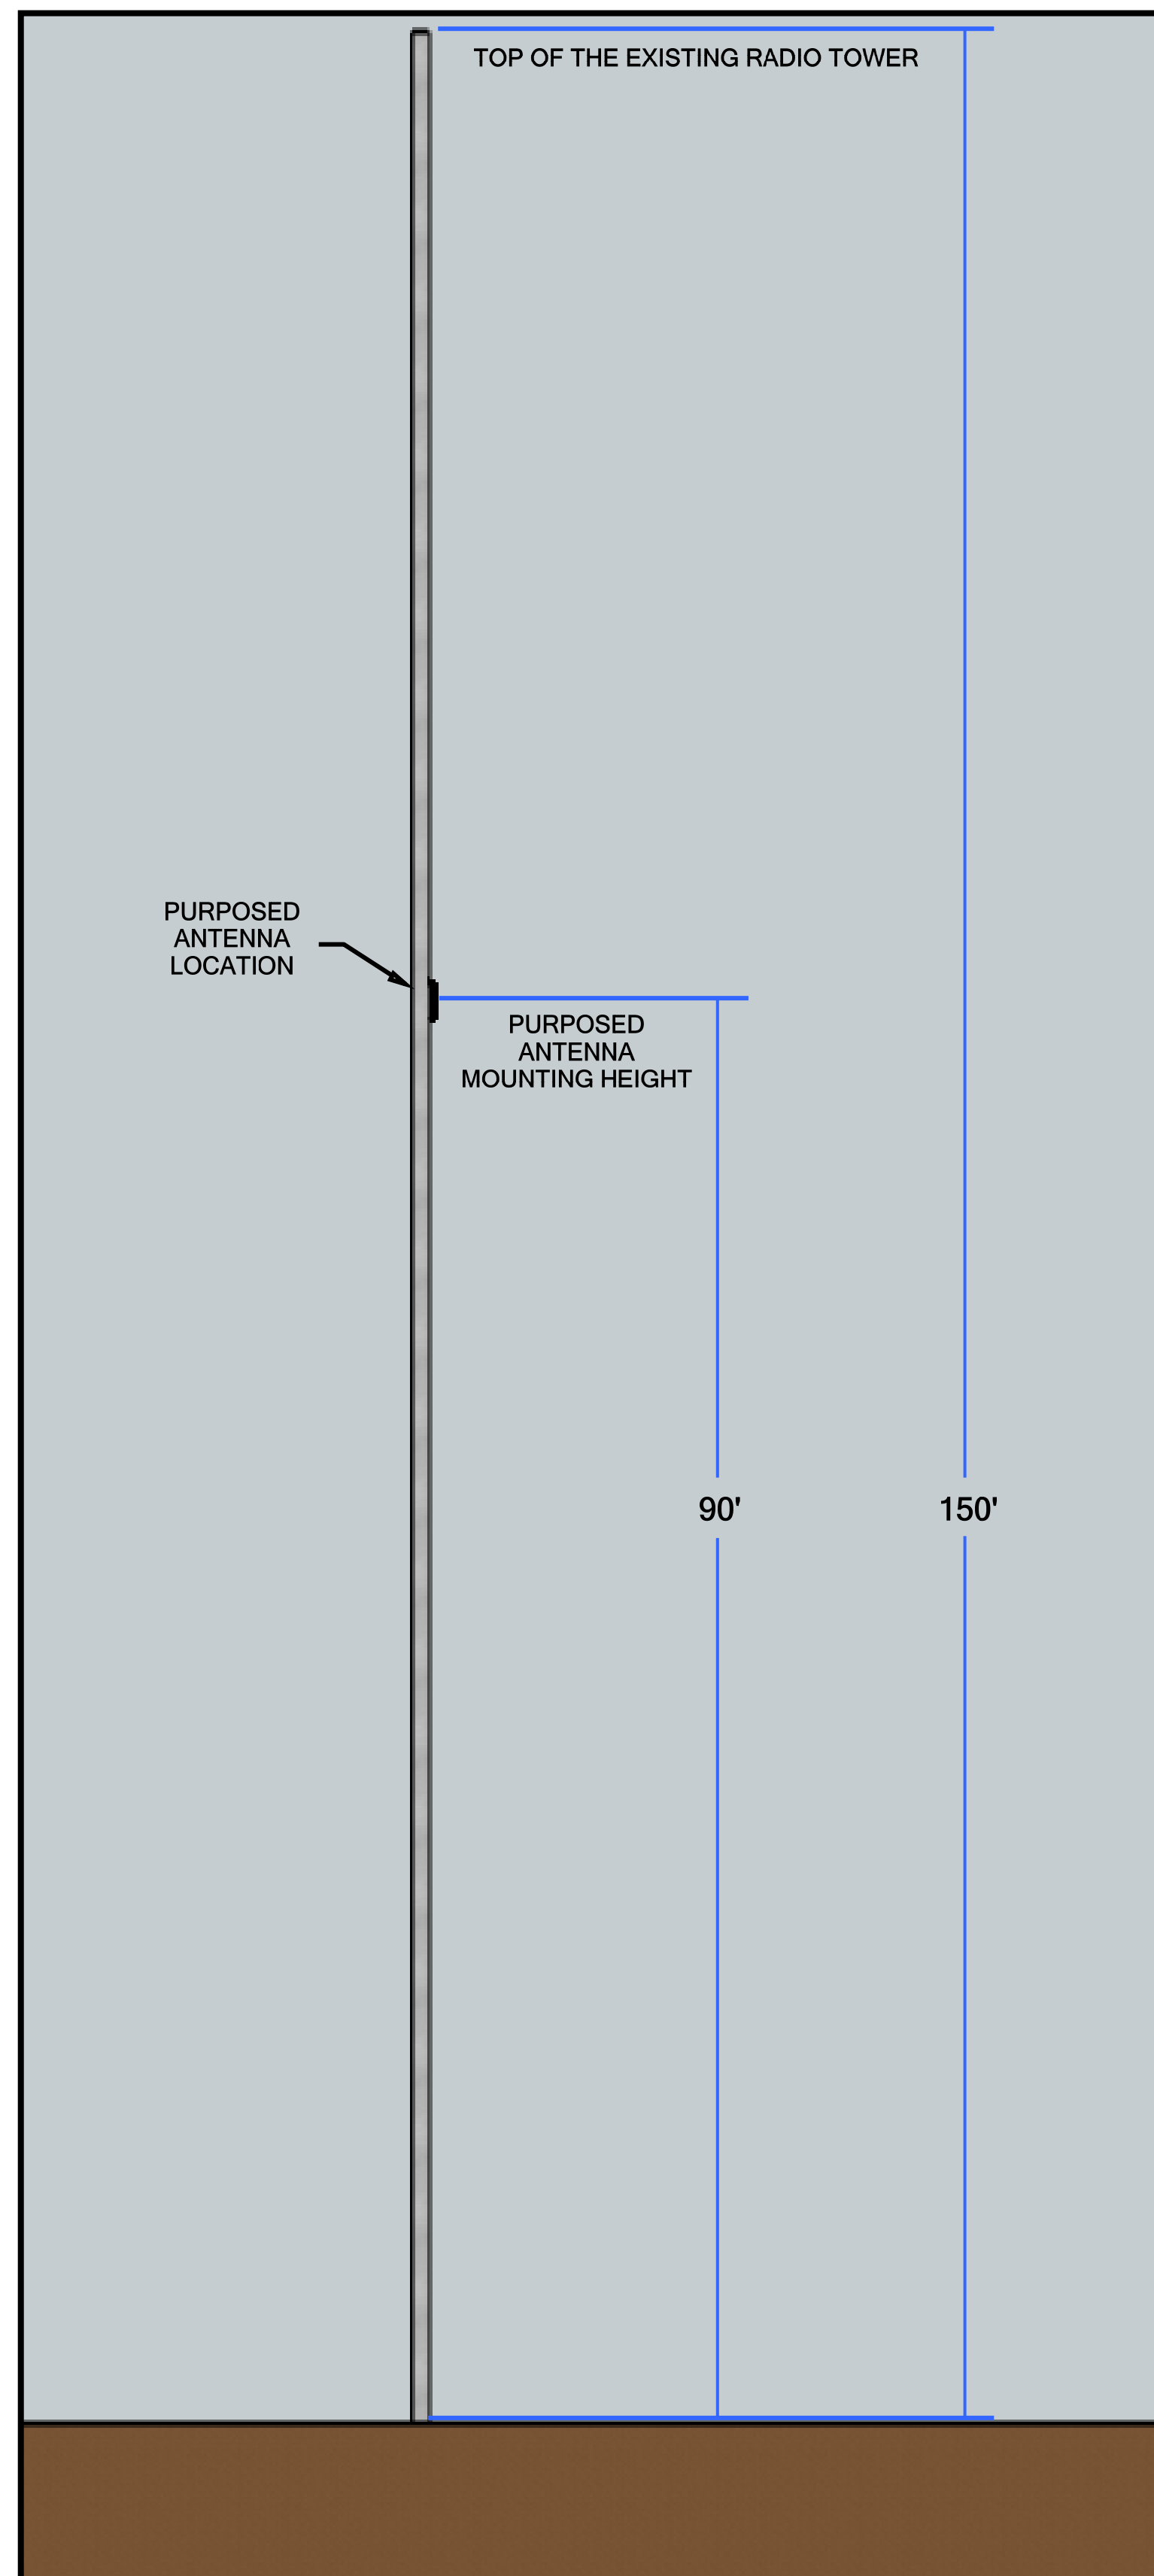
ELEVATION RENDERING OF EXISTING RADIO TOWER & PURPOSED ANTENNA LOCATION
